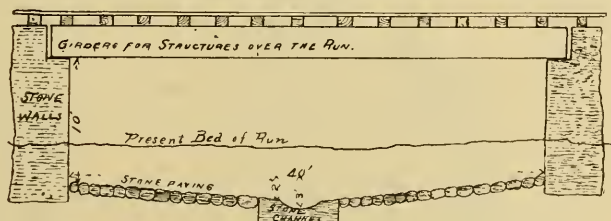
PROPOSED IMPROVED CHANNEL OF POGUE'S RUN.
